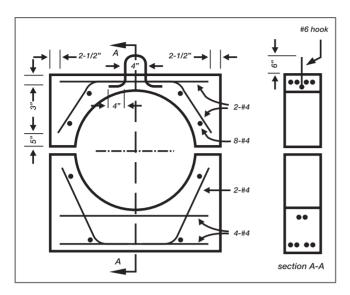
Typical Rebar Detail in Concrete Ballast Design
